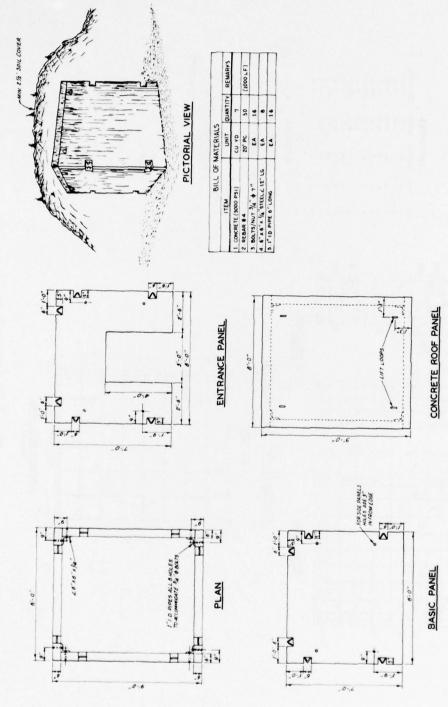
Structural plans for precast concrete panel quarters shelter (from Reference 54) (sheet 1 of 2)
